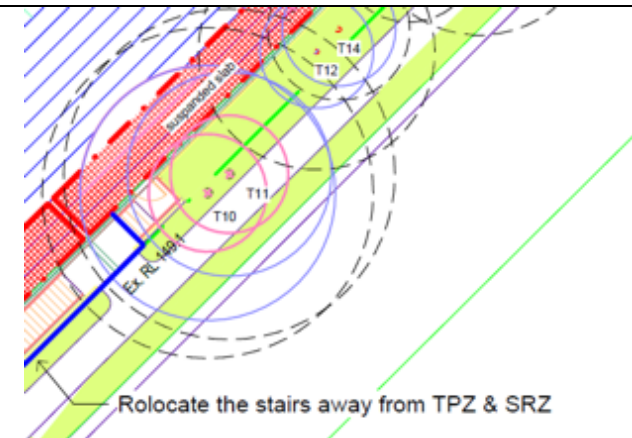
Level 0 Plan - Tree 10 Showing roof space, suspended slab (couter level).
